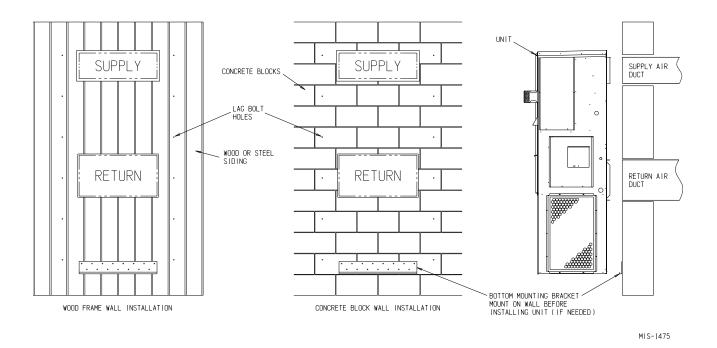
WALL MOUNTING INSTRUCTIONS
